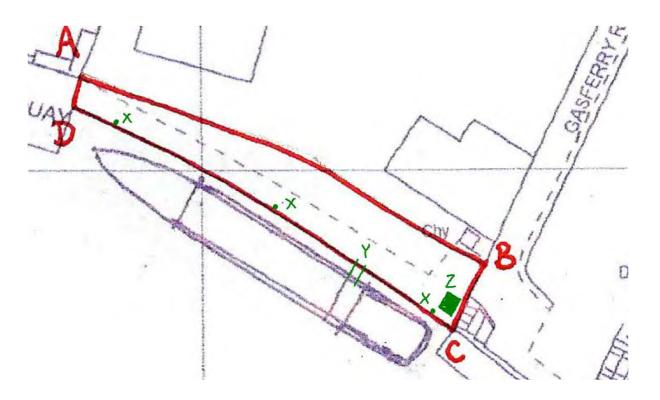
indicative plan showing alterations to the quay X = new mooring bollards Y = break in railings Z = storage pod
